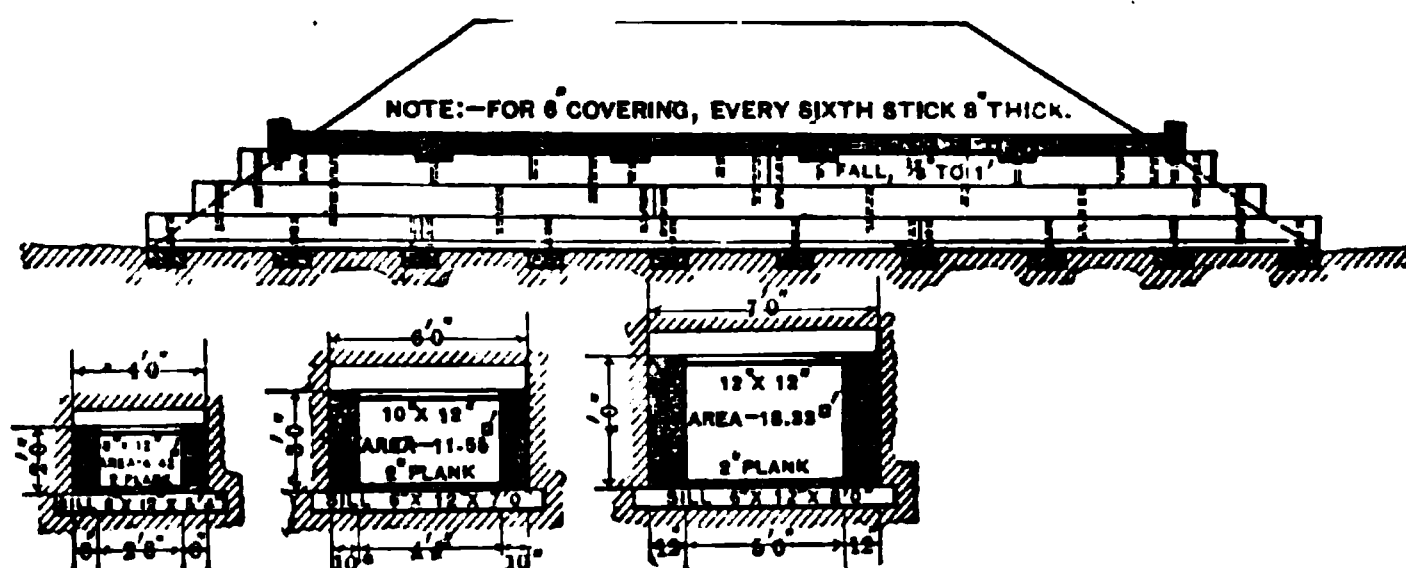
STANDARD TIMBER BOX CULVERT. C., M. & ST. P. RY. (Feb. 1889.)
